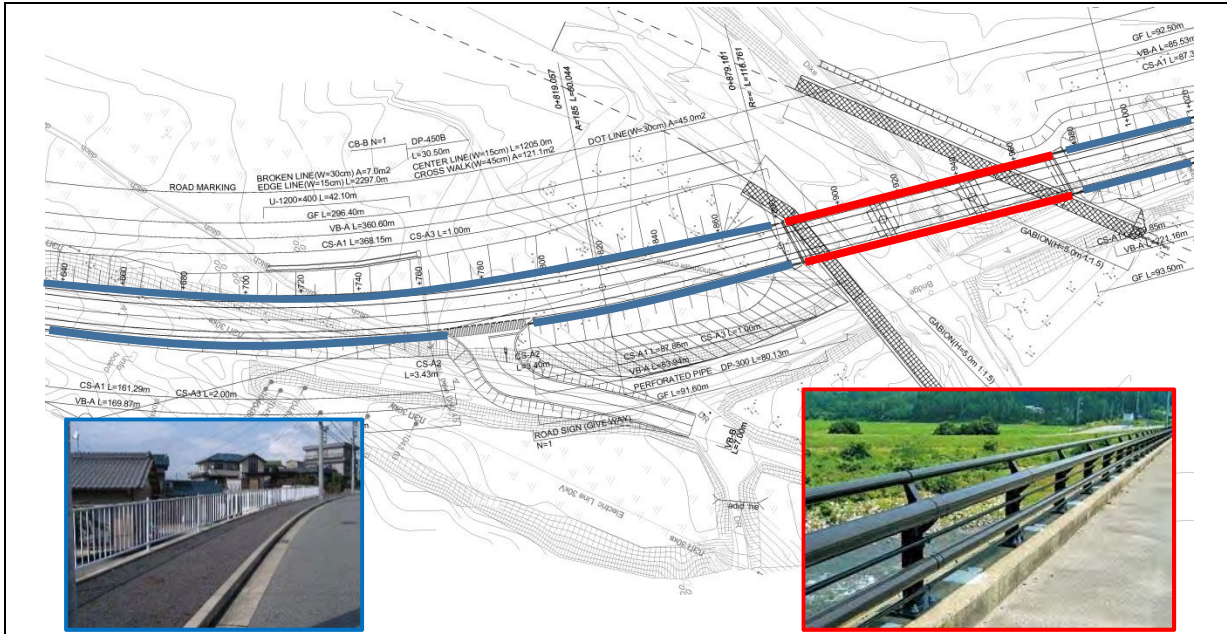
Allocation of Guardrails at the Bridge Section
